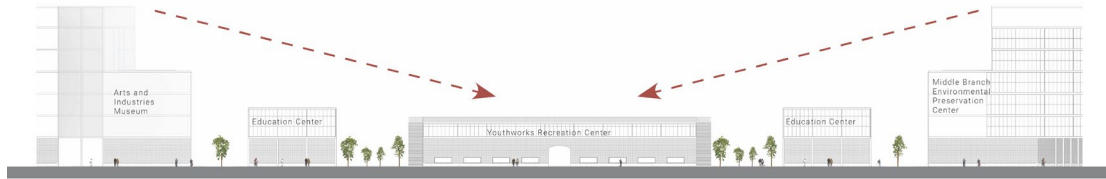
, Urban Center – Section – EW – Terracing (Source: Drawn by Author)
